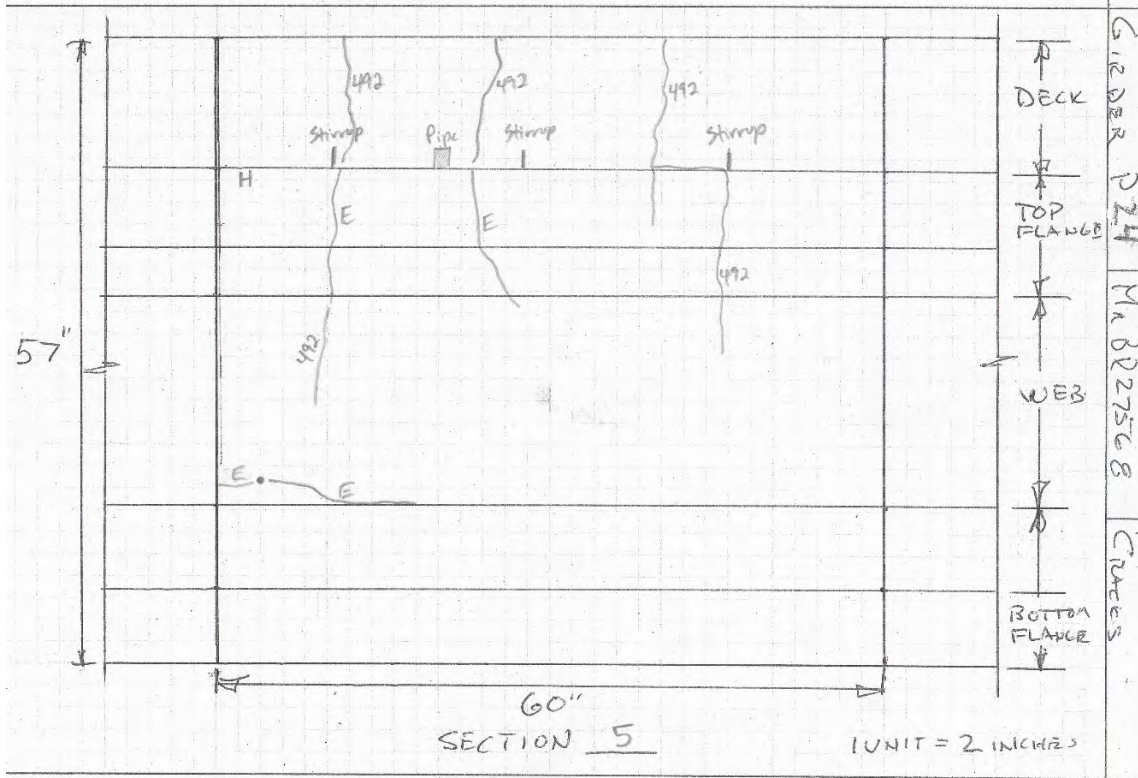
Girder P24 crack pattern – Section 5
